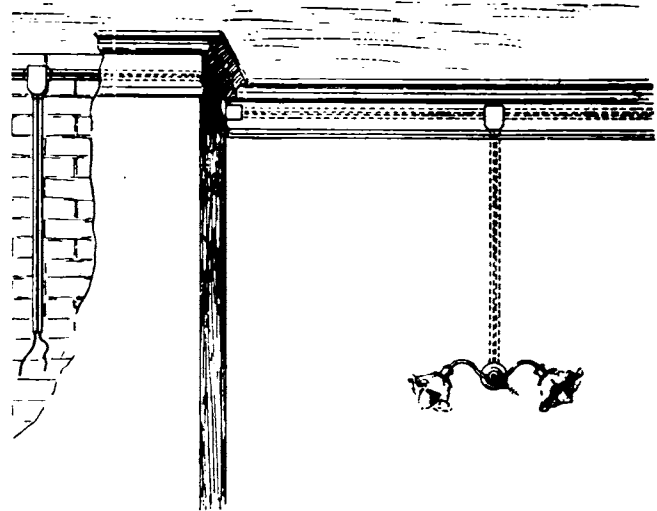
VULCA DUCTS BEHIND CORNICE AT CEILING.
